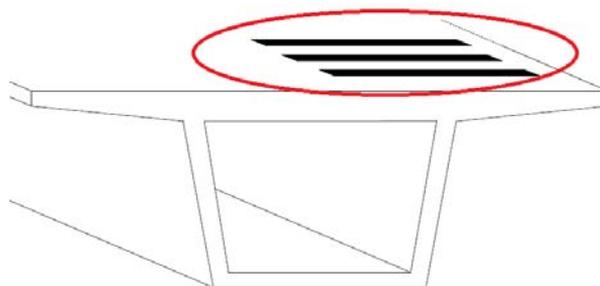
RC box-girder bridge strengthened in transverse direction with EB CFRP strips
